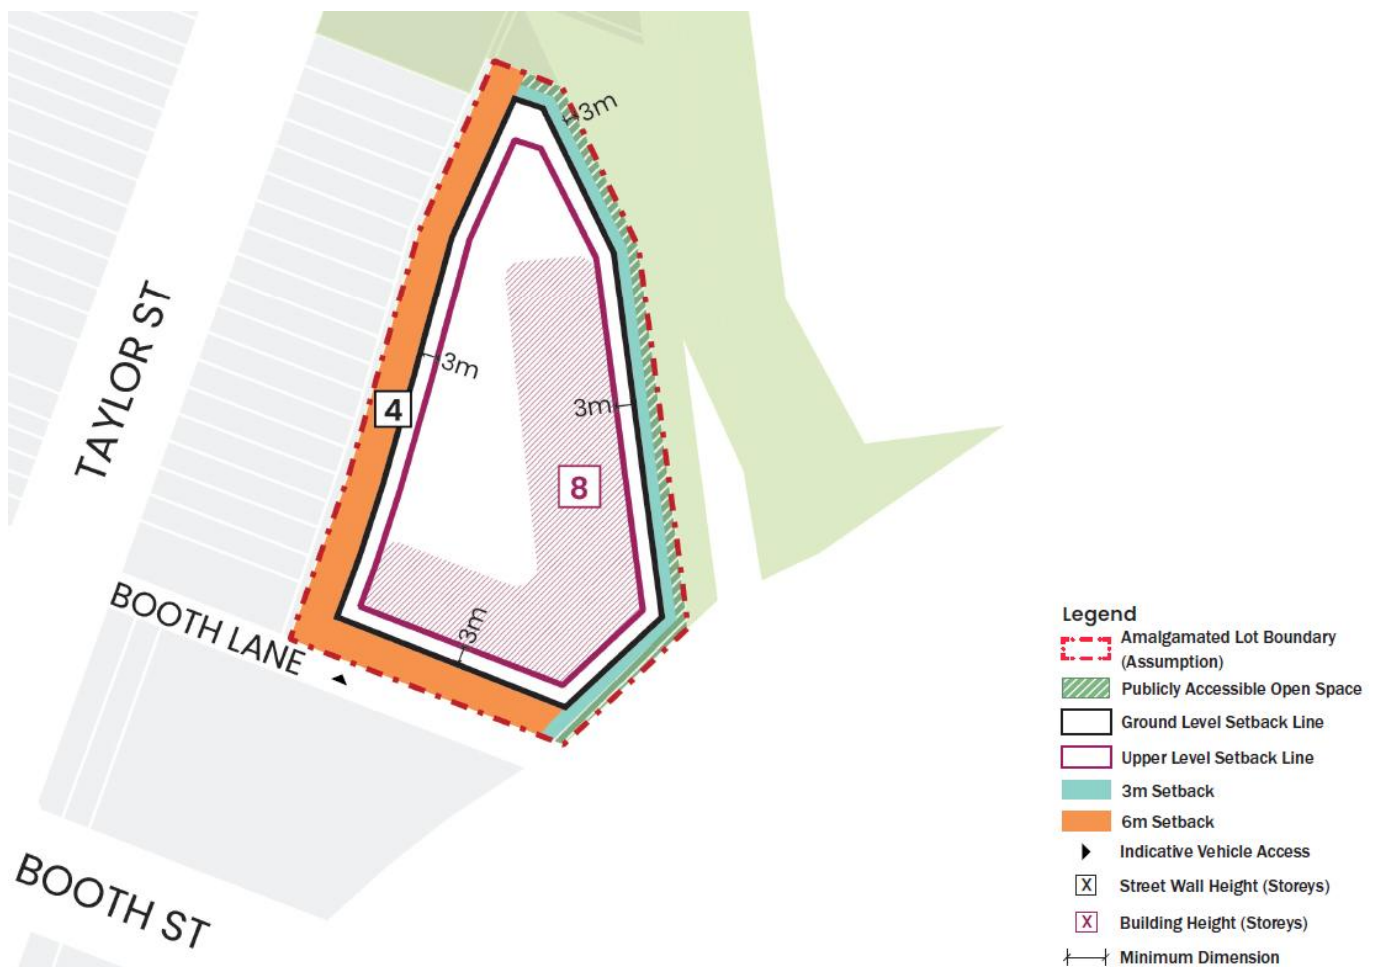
148 Wigram Road – Indicative Layout and Design Principles
